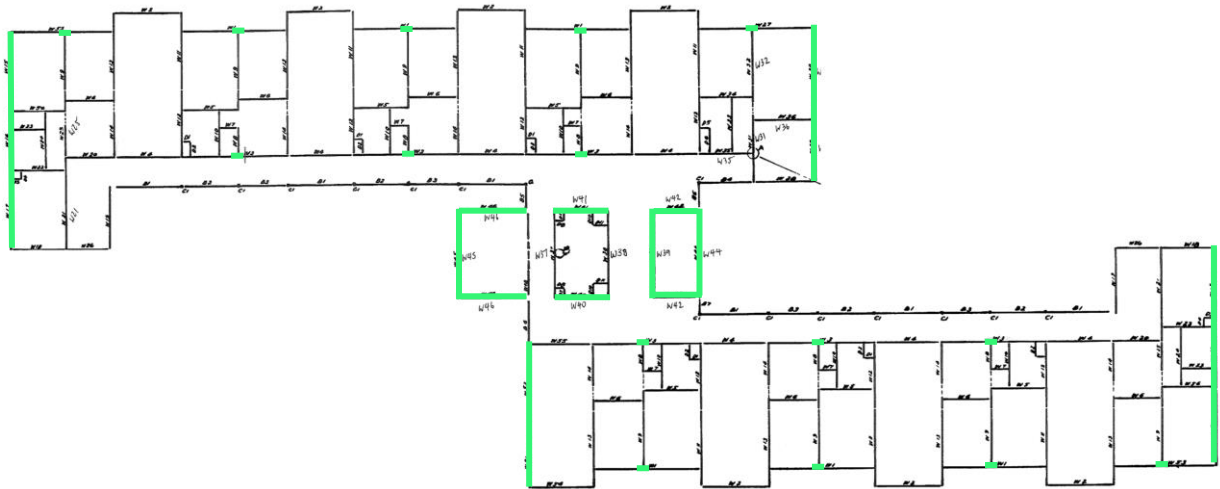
Plan view of typical floor highlighting where pre-cast wall panel dowel continues from panel below and into panel above (green)
